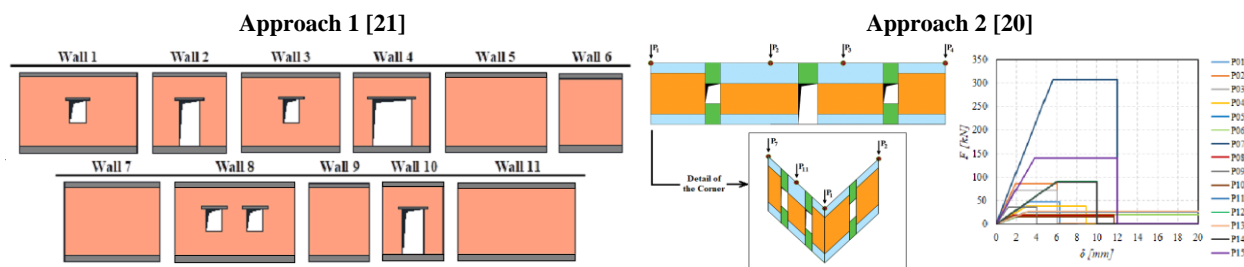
Walls of the peasant house archetypes A0/A1 and possible modelling approaches [EC2, EC5].
